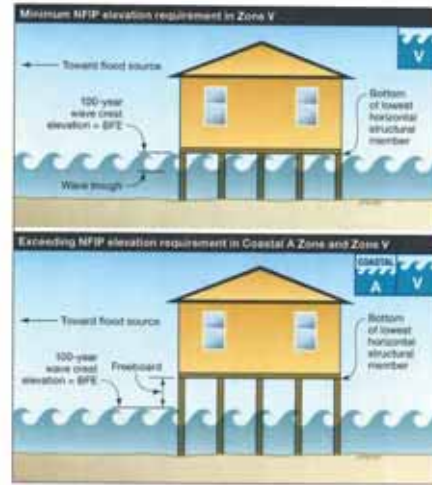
Recommended elevation for buildings in Coastal A Zone and Zone V compared to minimum requirements
